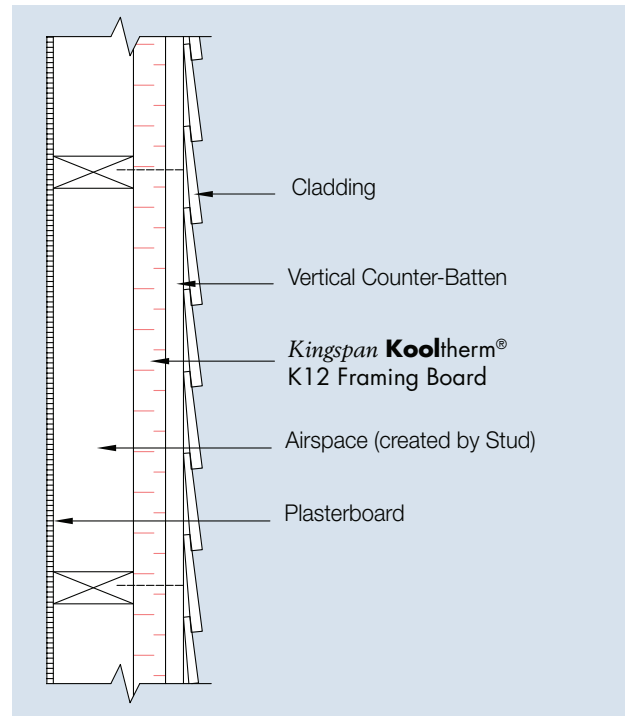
Side elevation – Stud wall with Kingspan Kooltherm® K12 Framing Board and vertical counter-battens using an internal plasterboard lining
